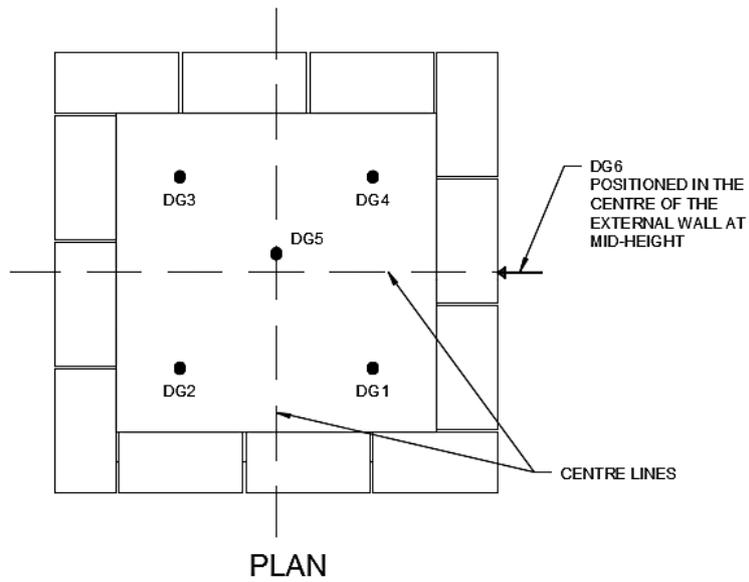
Plan view of NUI Galway Pyrite Foundation Model showing locations of DG1-DG6
